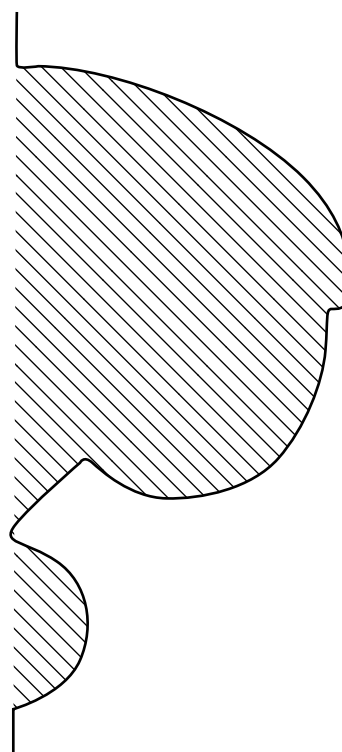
Moulding profile for Amoria plaque and string course on south-facing exterior elevation
